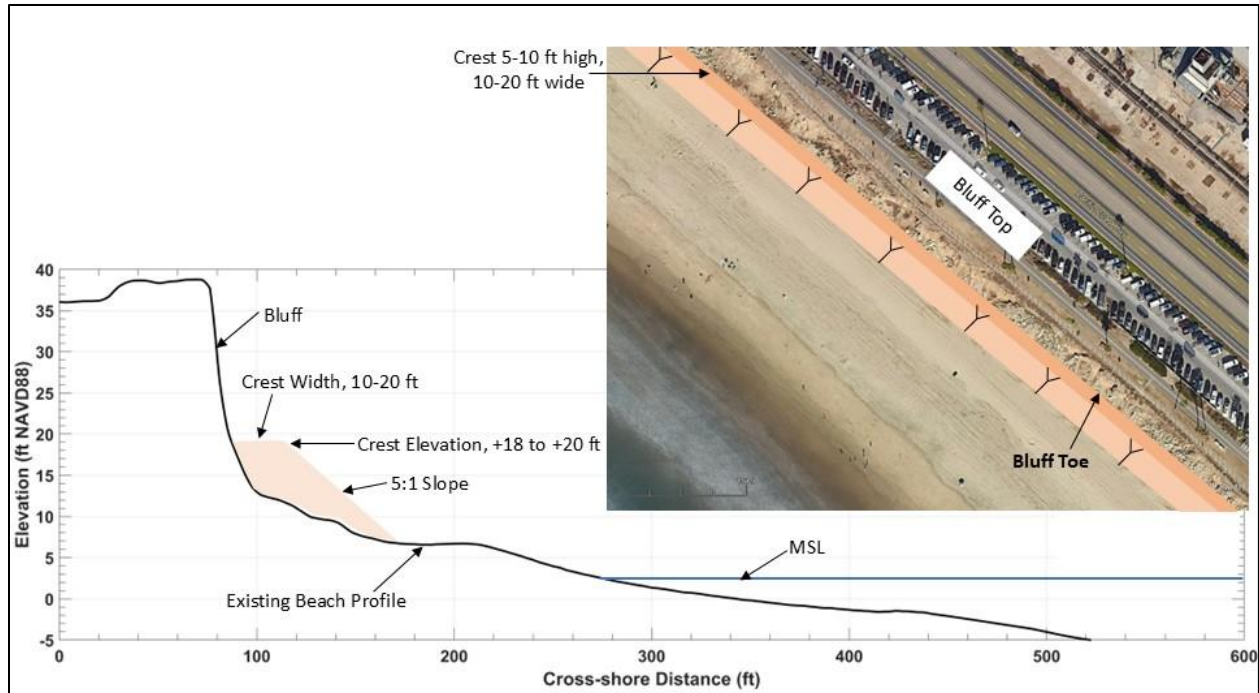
Backbeach Bluff/Cliff Stabilization Design Plan View and Cross Section
